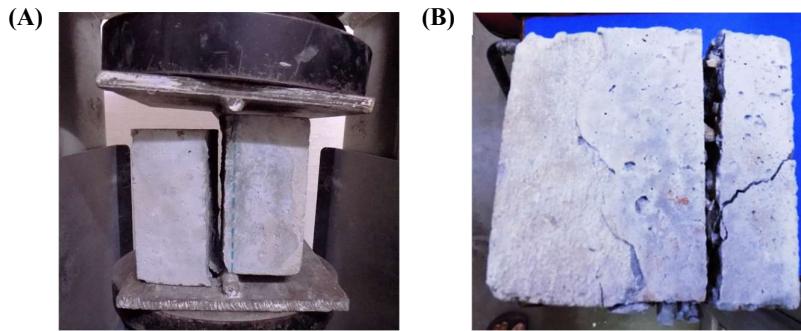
Failure behaviour, in which (A) SPT specimen failure, and (B) BSST specimen failure.
